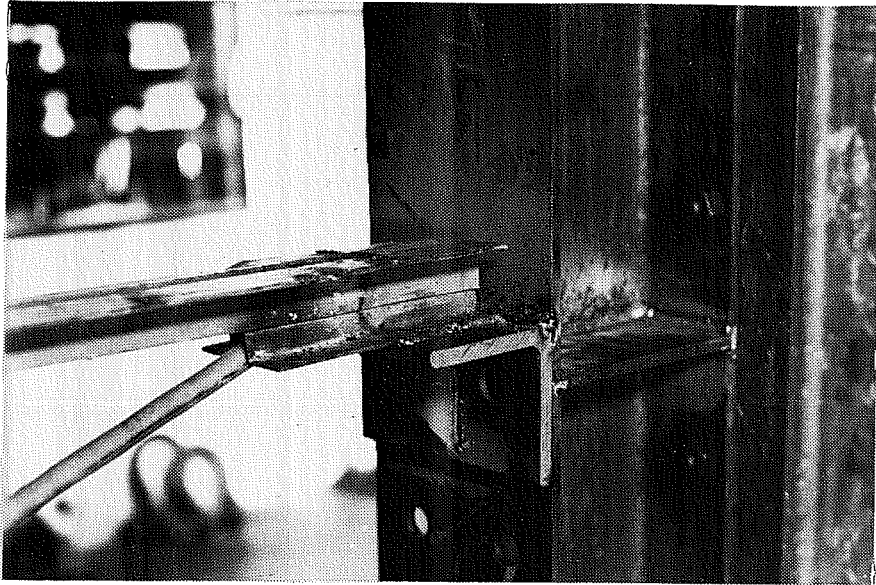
Connection at North End of Joist No. 3 (cont.)
